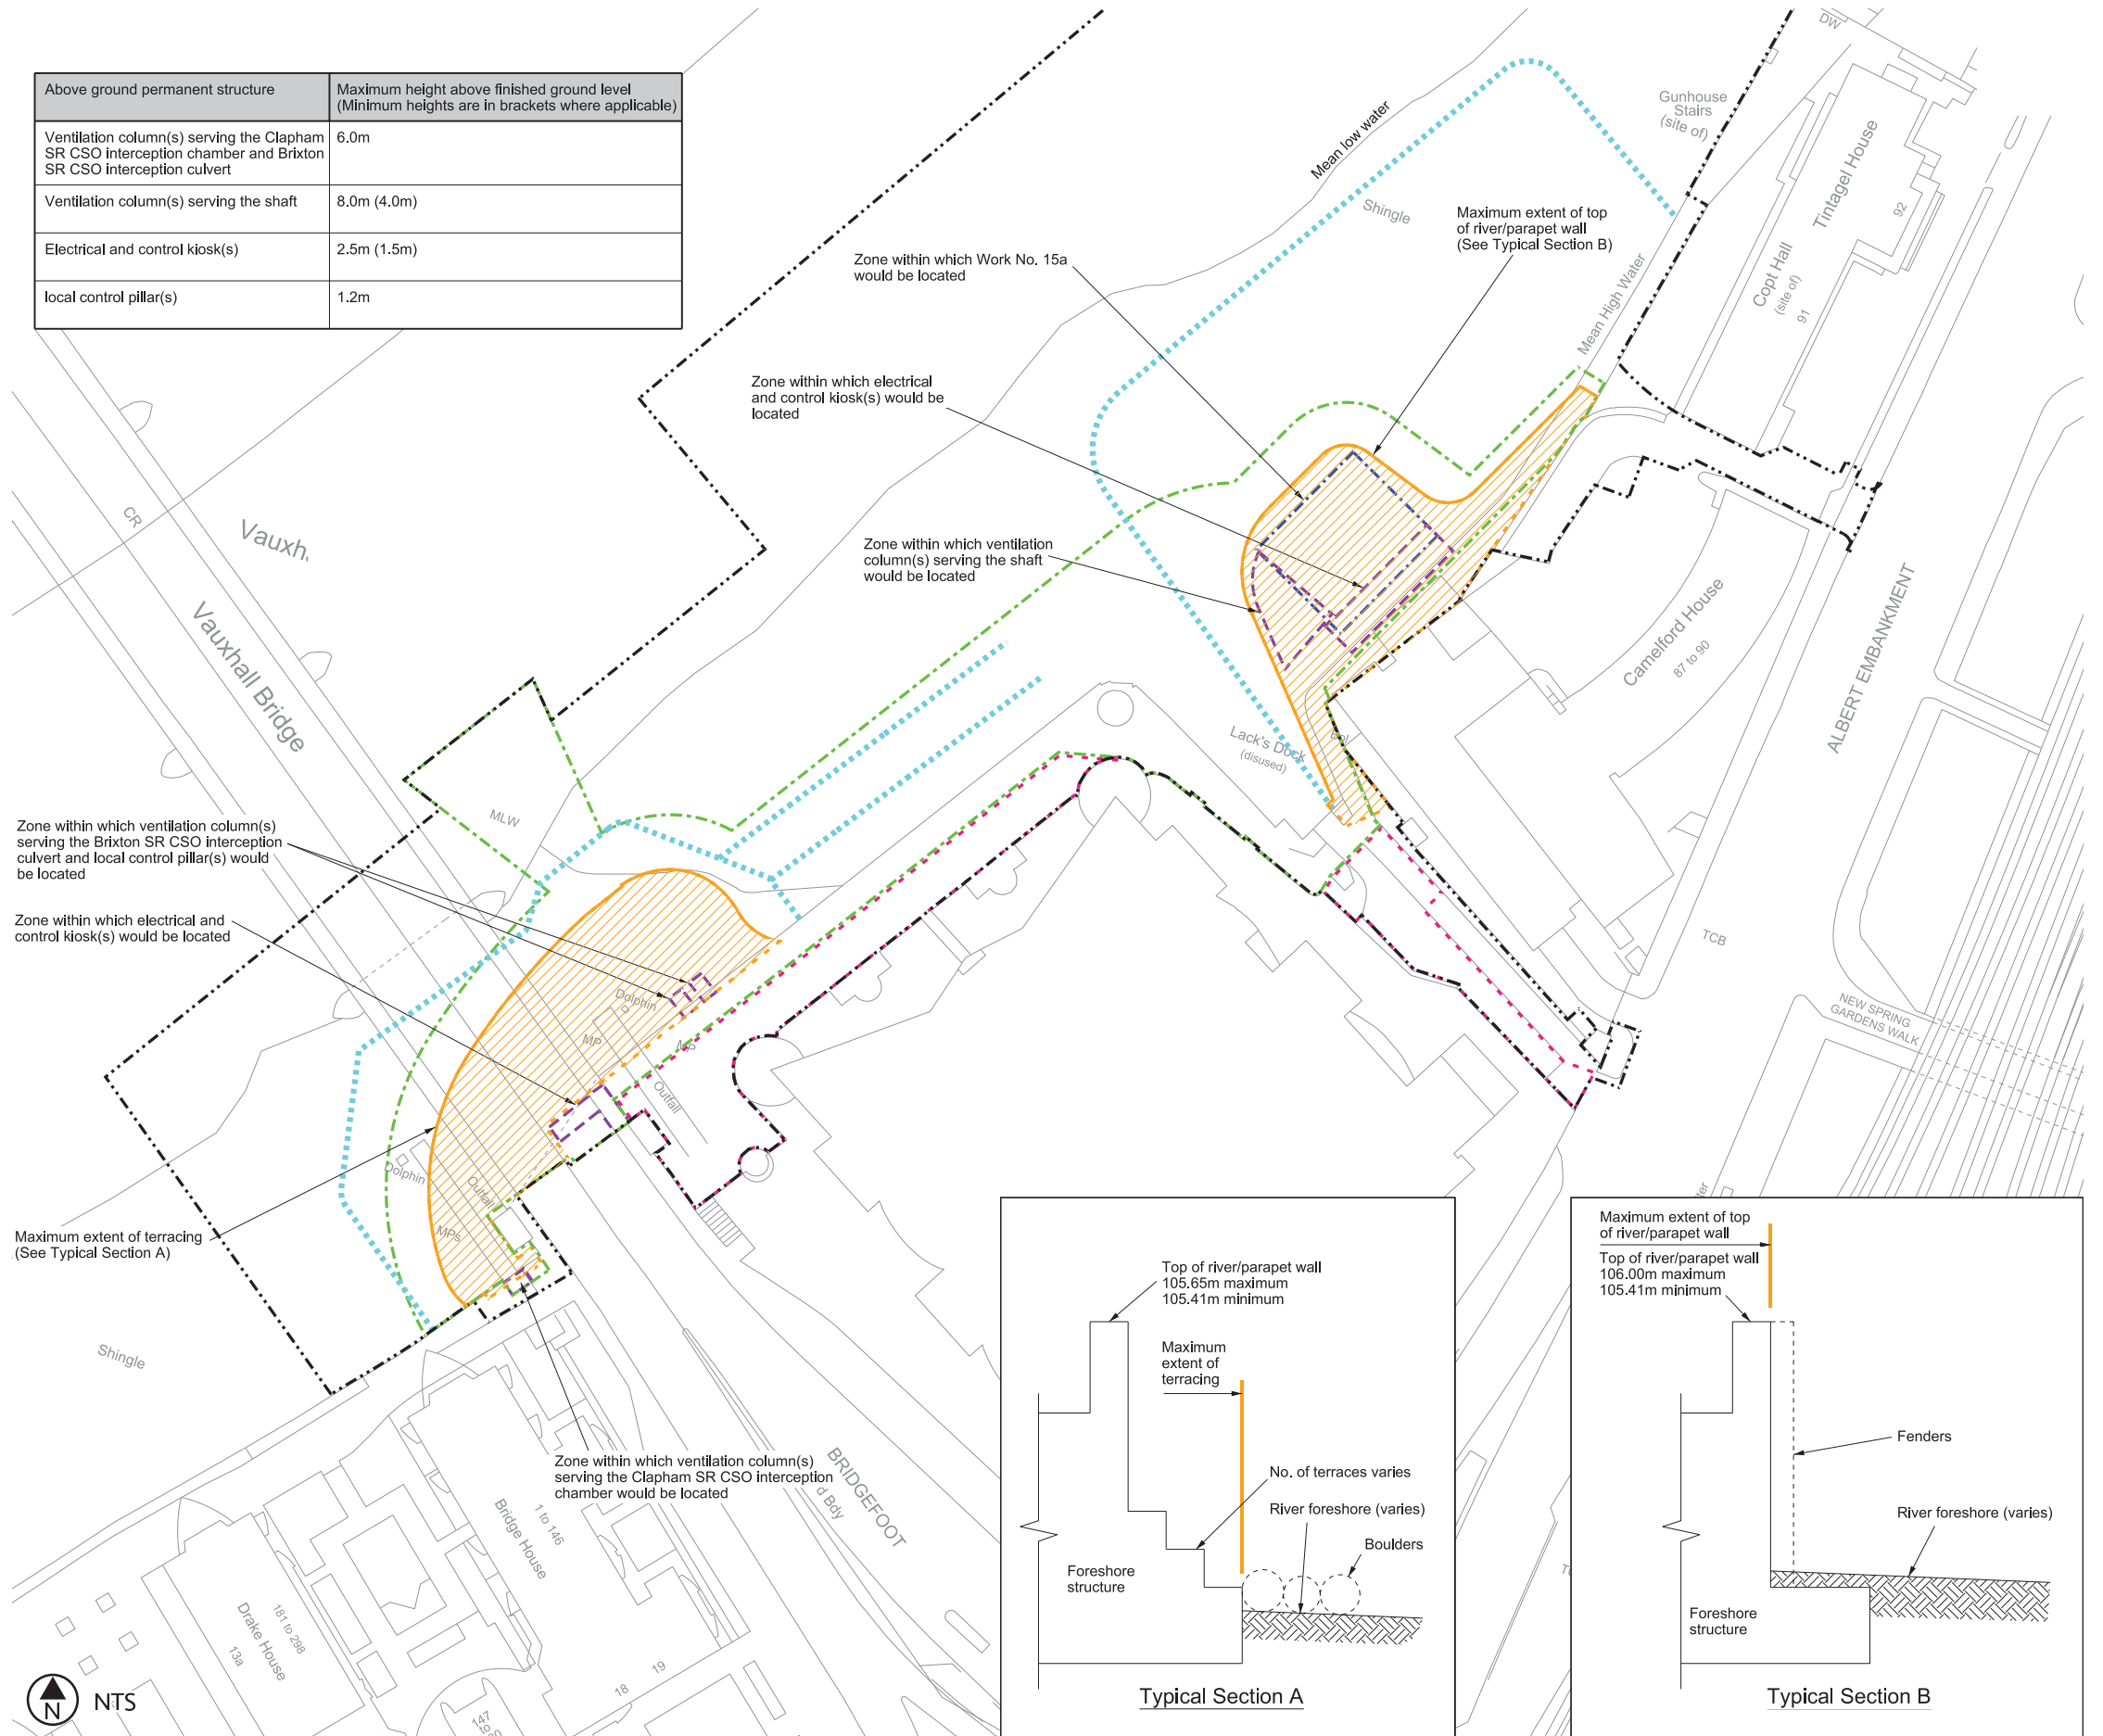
Site works parameter plan - refer to Site works parameter plan in the *Book of Plans
